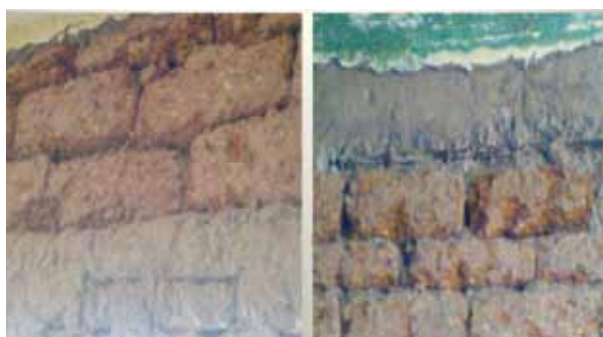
Spalled plaster, fungus growth on walls
